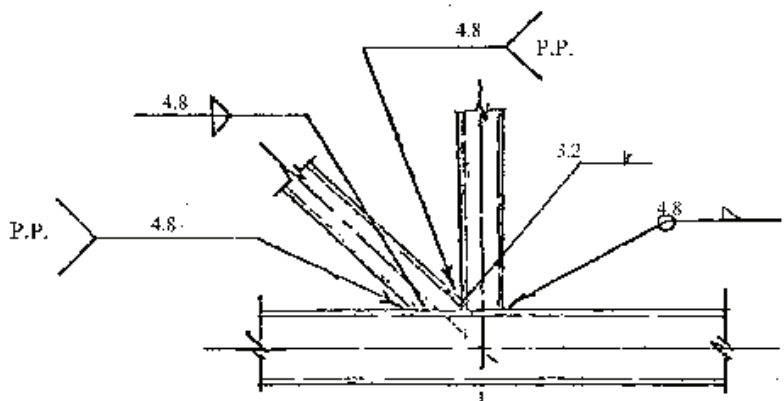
Detail of the failed joint. Weld sizes are in mm.
